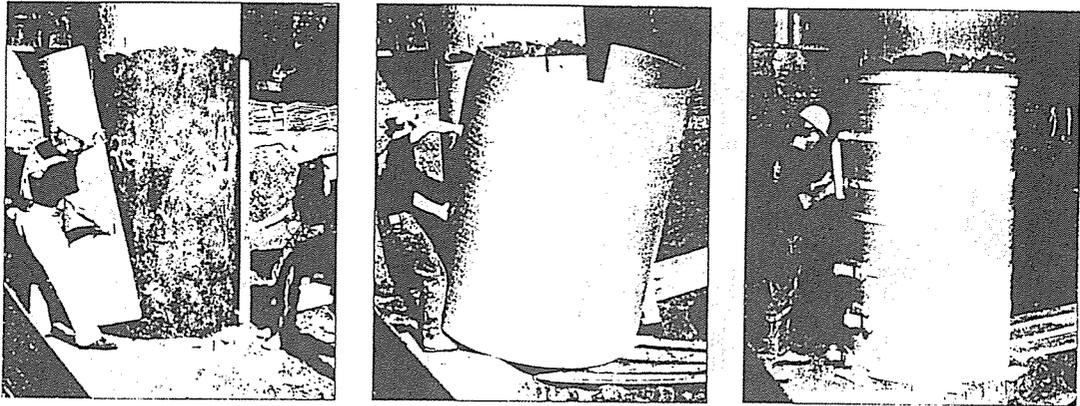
Snap Tite™ Installation for Column Retrofitting[12]
